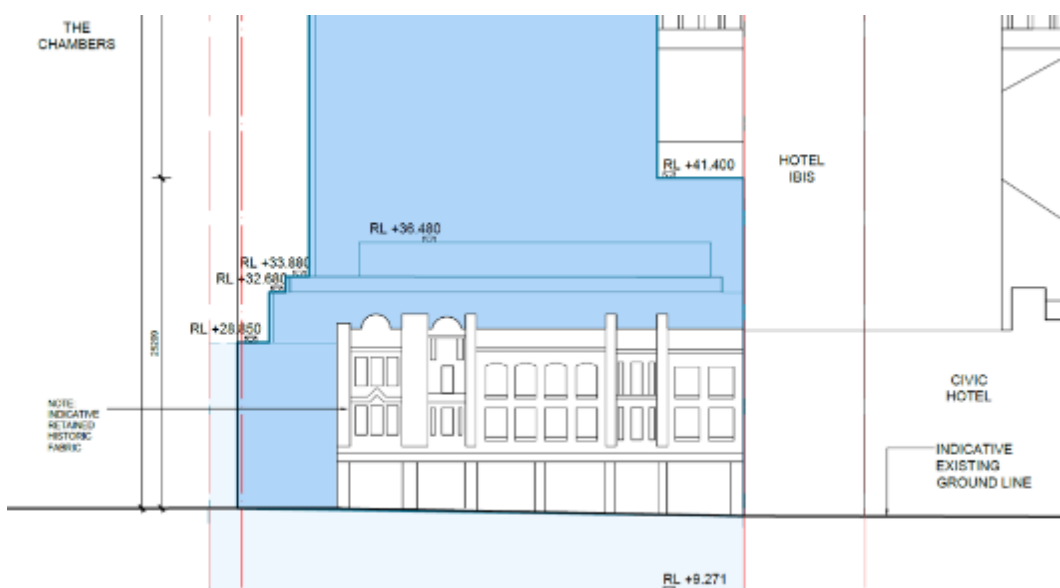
Proposed concept envelope (north elevation) introducing the landscape vessel between the approved lower and upper podium to Pitt Street
